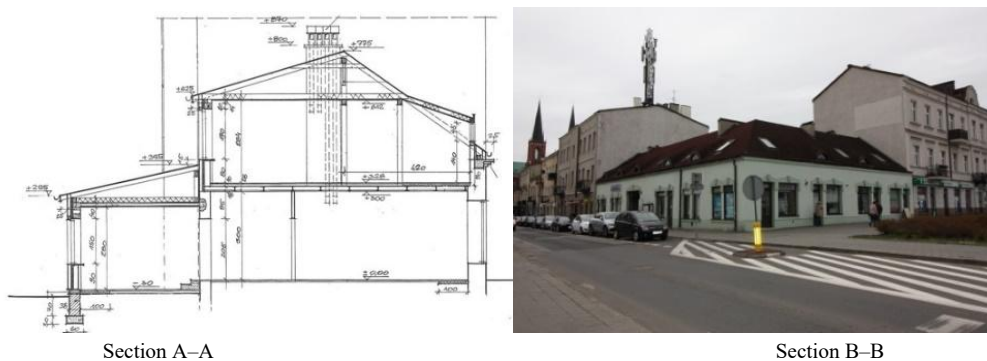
The cross-sections of the building. The visible reinforced concrete stairs to the residential part on the first floor (cross-section A-A). The cross-section through tenement houses. The visible outbuilding added from the south side (cross-section B-B). Author of the study: Arch. Lech Nowotarski
